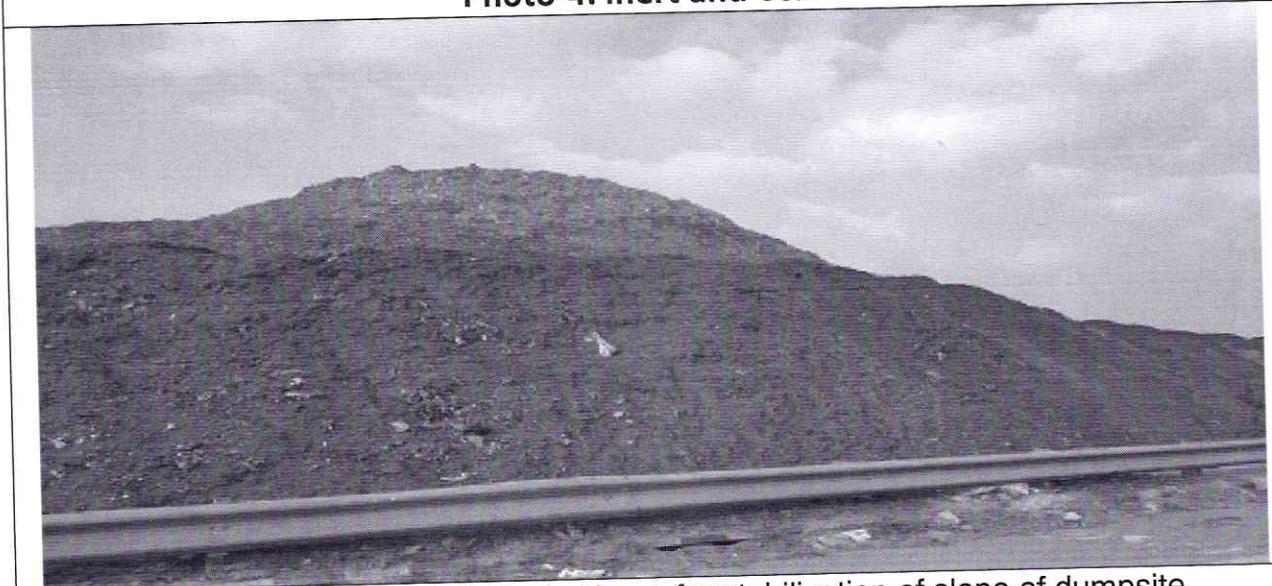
Utilization of Collected inert for stabilization of slope of dumpsite
